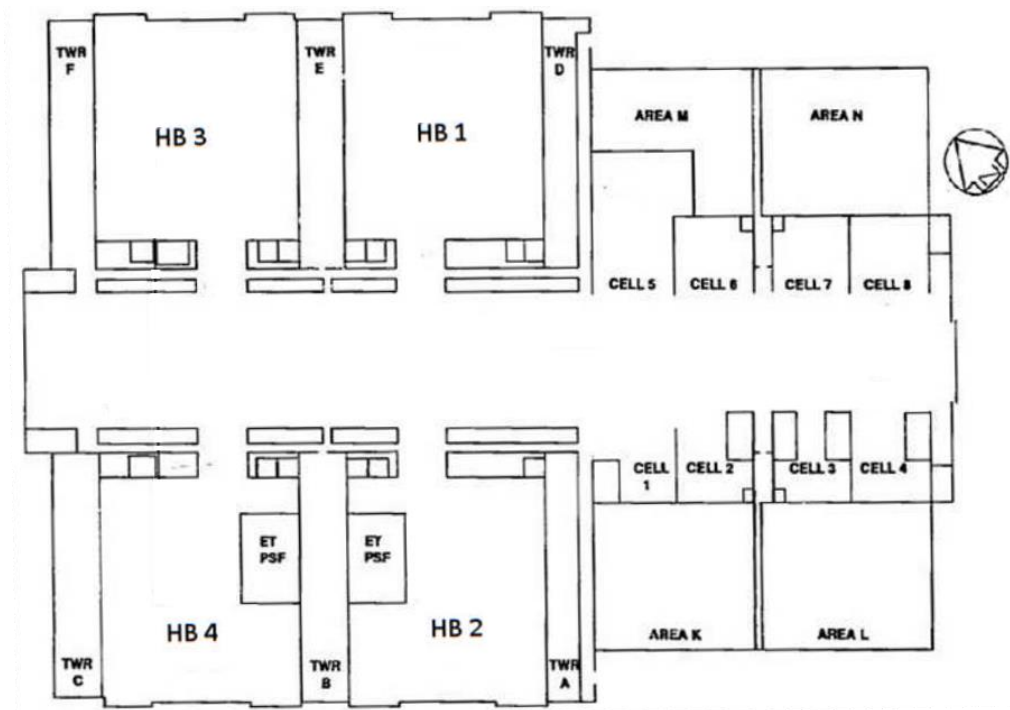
Vehicle Assembly Building (VAB) Floor Plan
